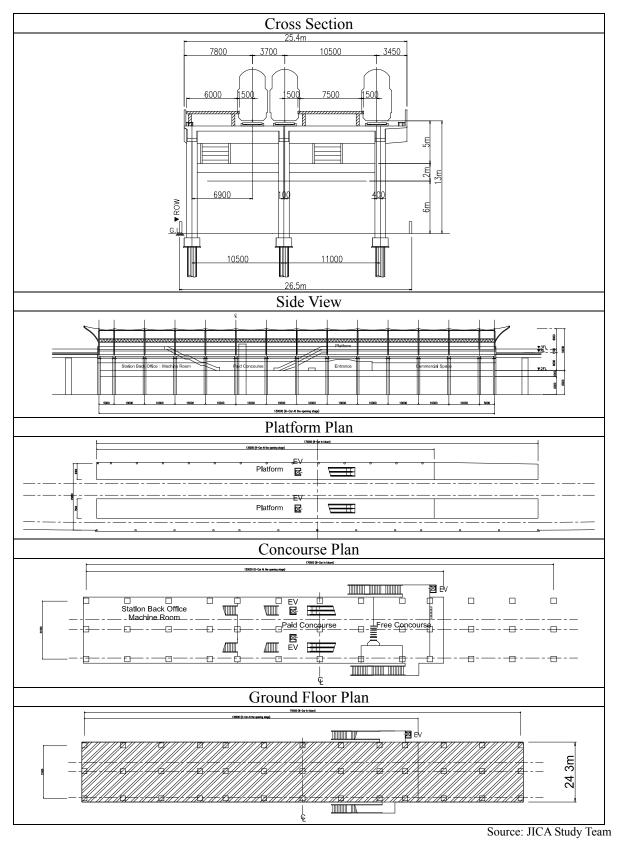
Station Plan (Elevated 2-Island, Manghopir)
